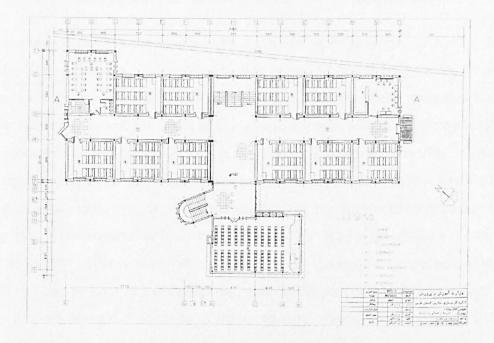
Ground floor plan of Jahan-Ara School, courtesy of Iranian Education Department
